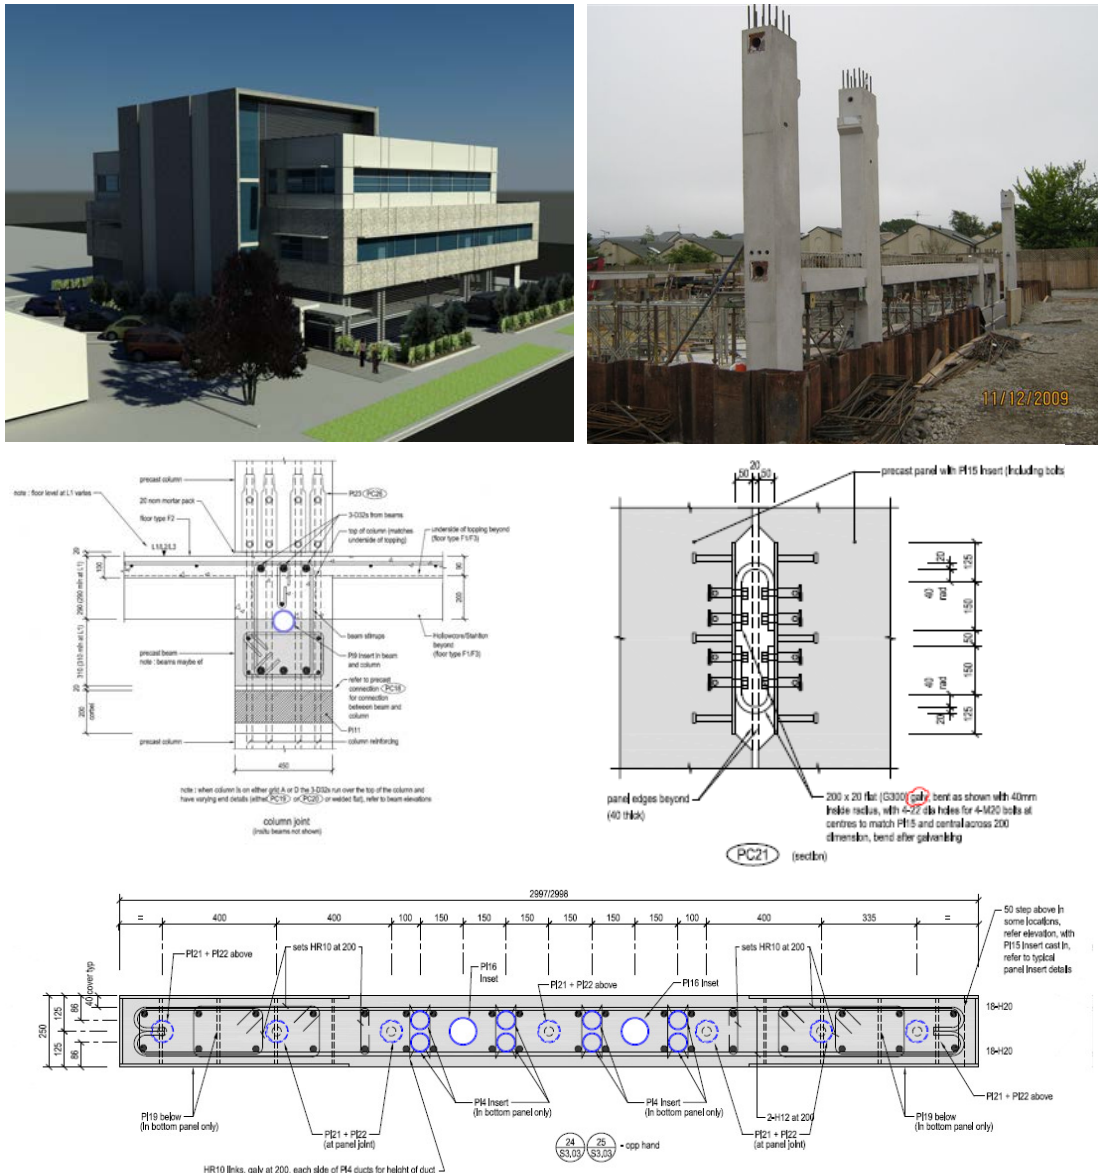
Southern Cross Hospital, Christchurch Rendering, construction of the frame, details of beams, walls and UFP dissipaters (Structural Engineers: Structex; Pampanin et al., 2011).
